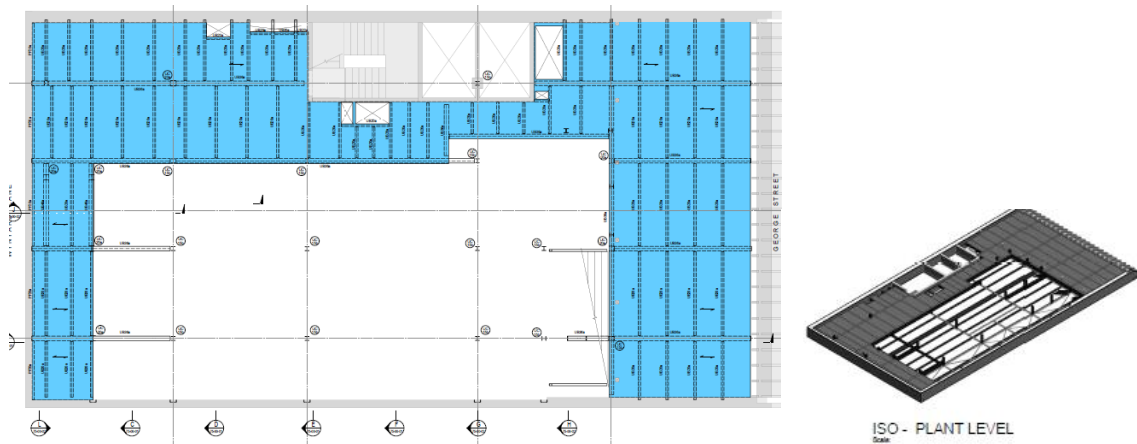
Proposed plant level outline plan, steel frame location. (Source: TTW, drawing number ST-285- 60-00-55, November 2018)
